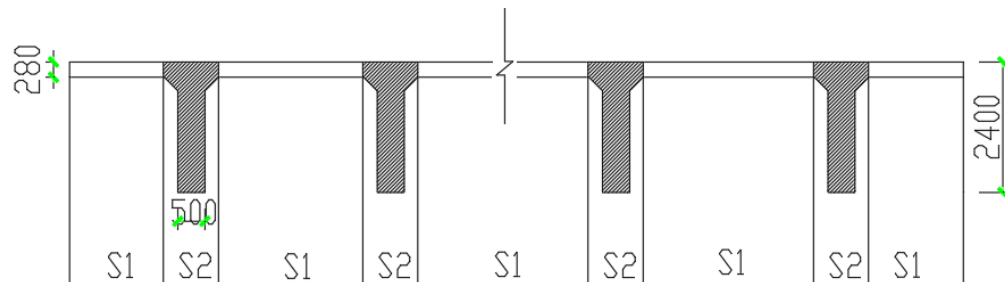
Schematic diagram of transverse division of preloading area of frame beam
